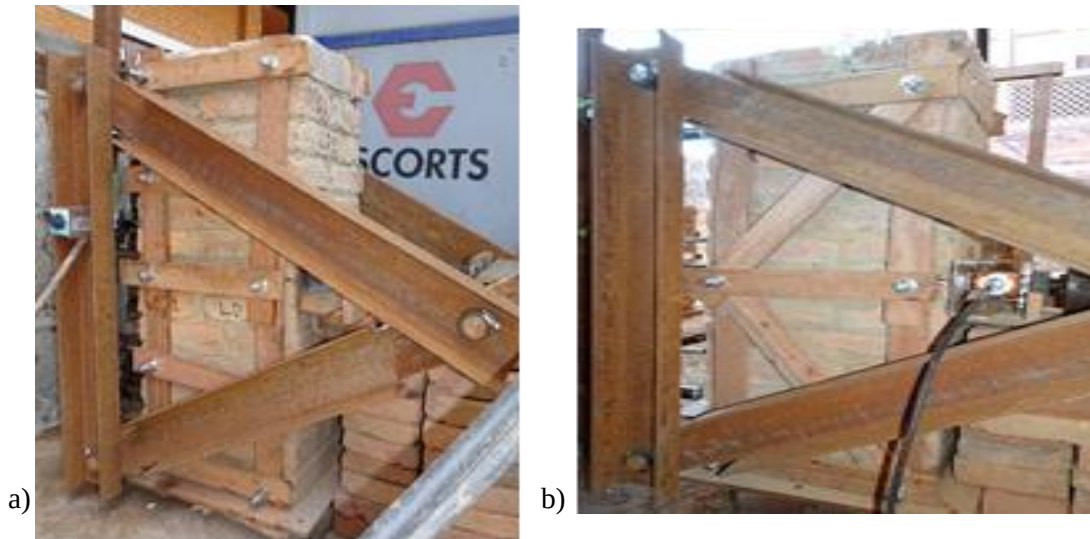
a) Bending test on prism reinforced with ladder type braces b) Bending test on prism reinforced with diagonal braces
